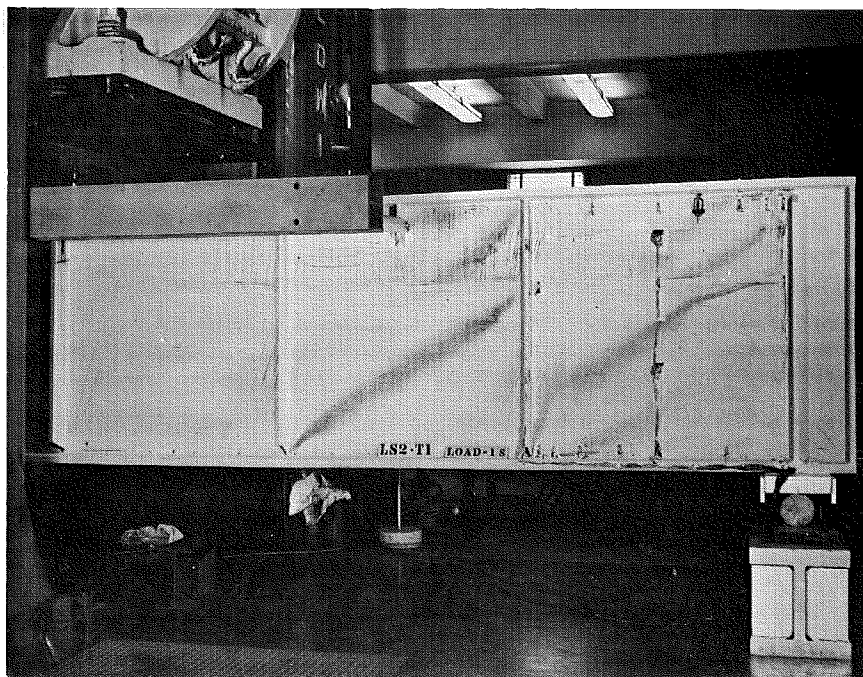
Girder LS2 at Load No. 18 (- x end)
